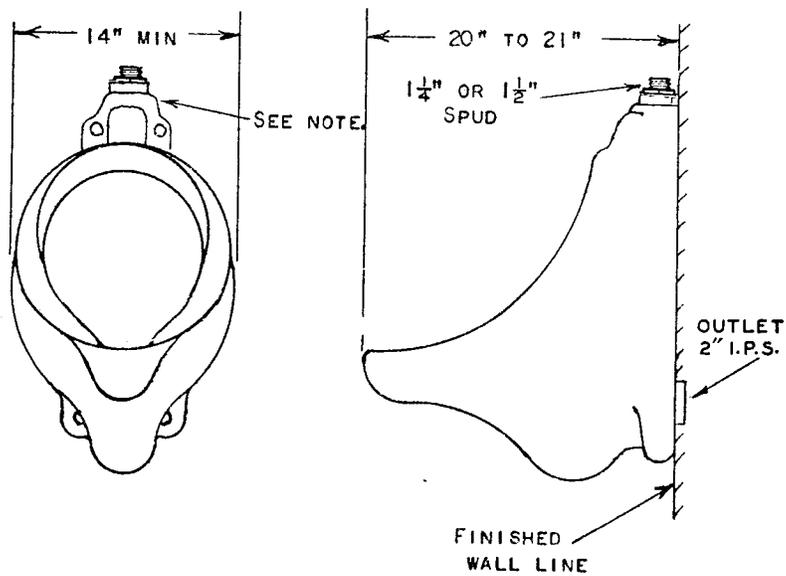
WALL-HANGING BLOWOUT URINAL. (PAR. 4.3.1.)
